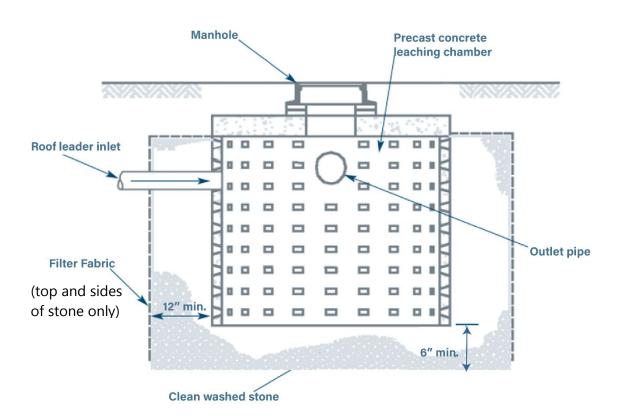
Schematic of Typical Perforated Precast Concrete Drywell
